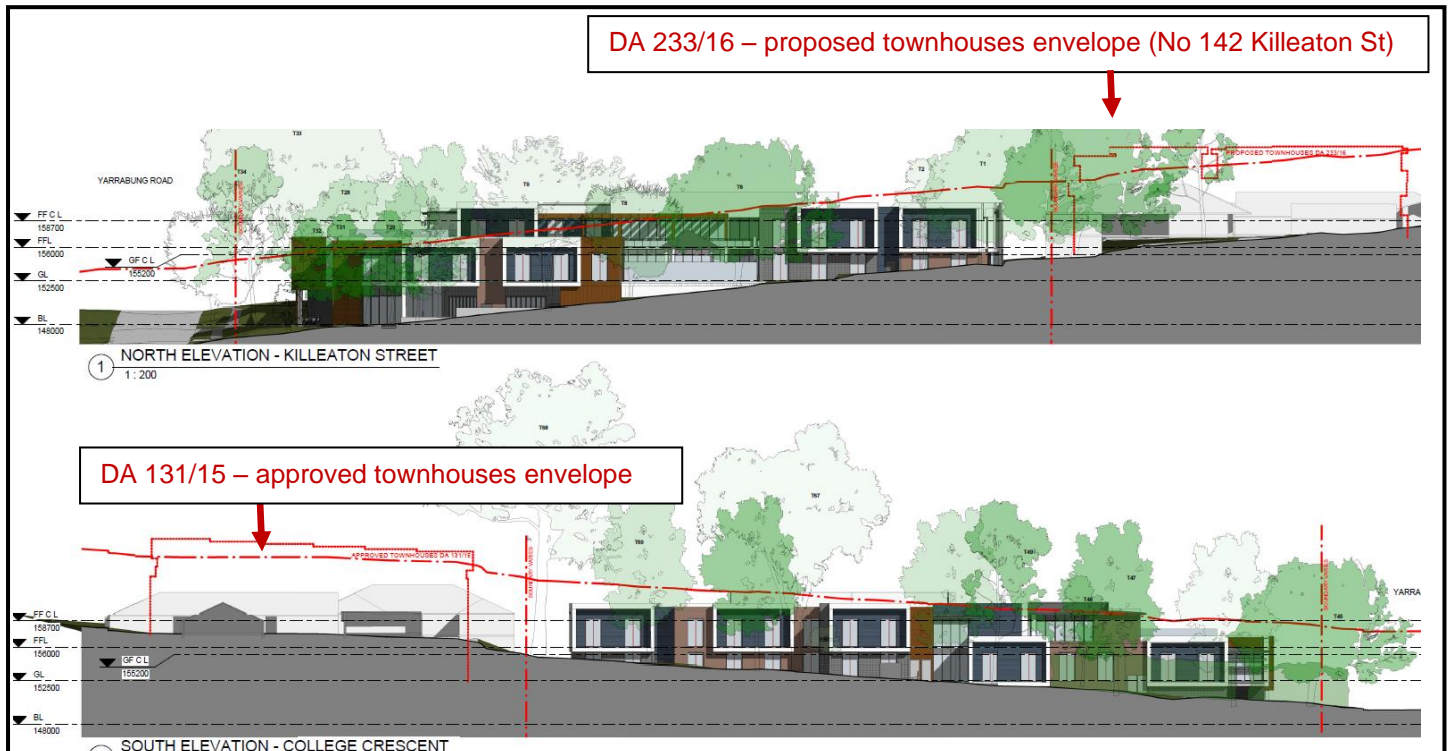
Building elevations showing relationship to approved/proposed townhouses to western side of RACF site.
